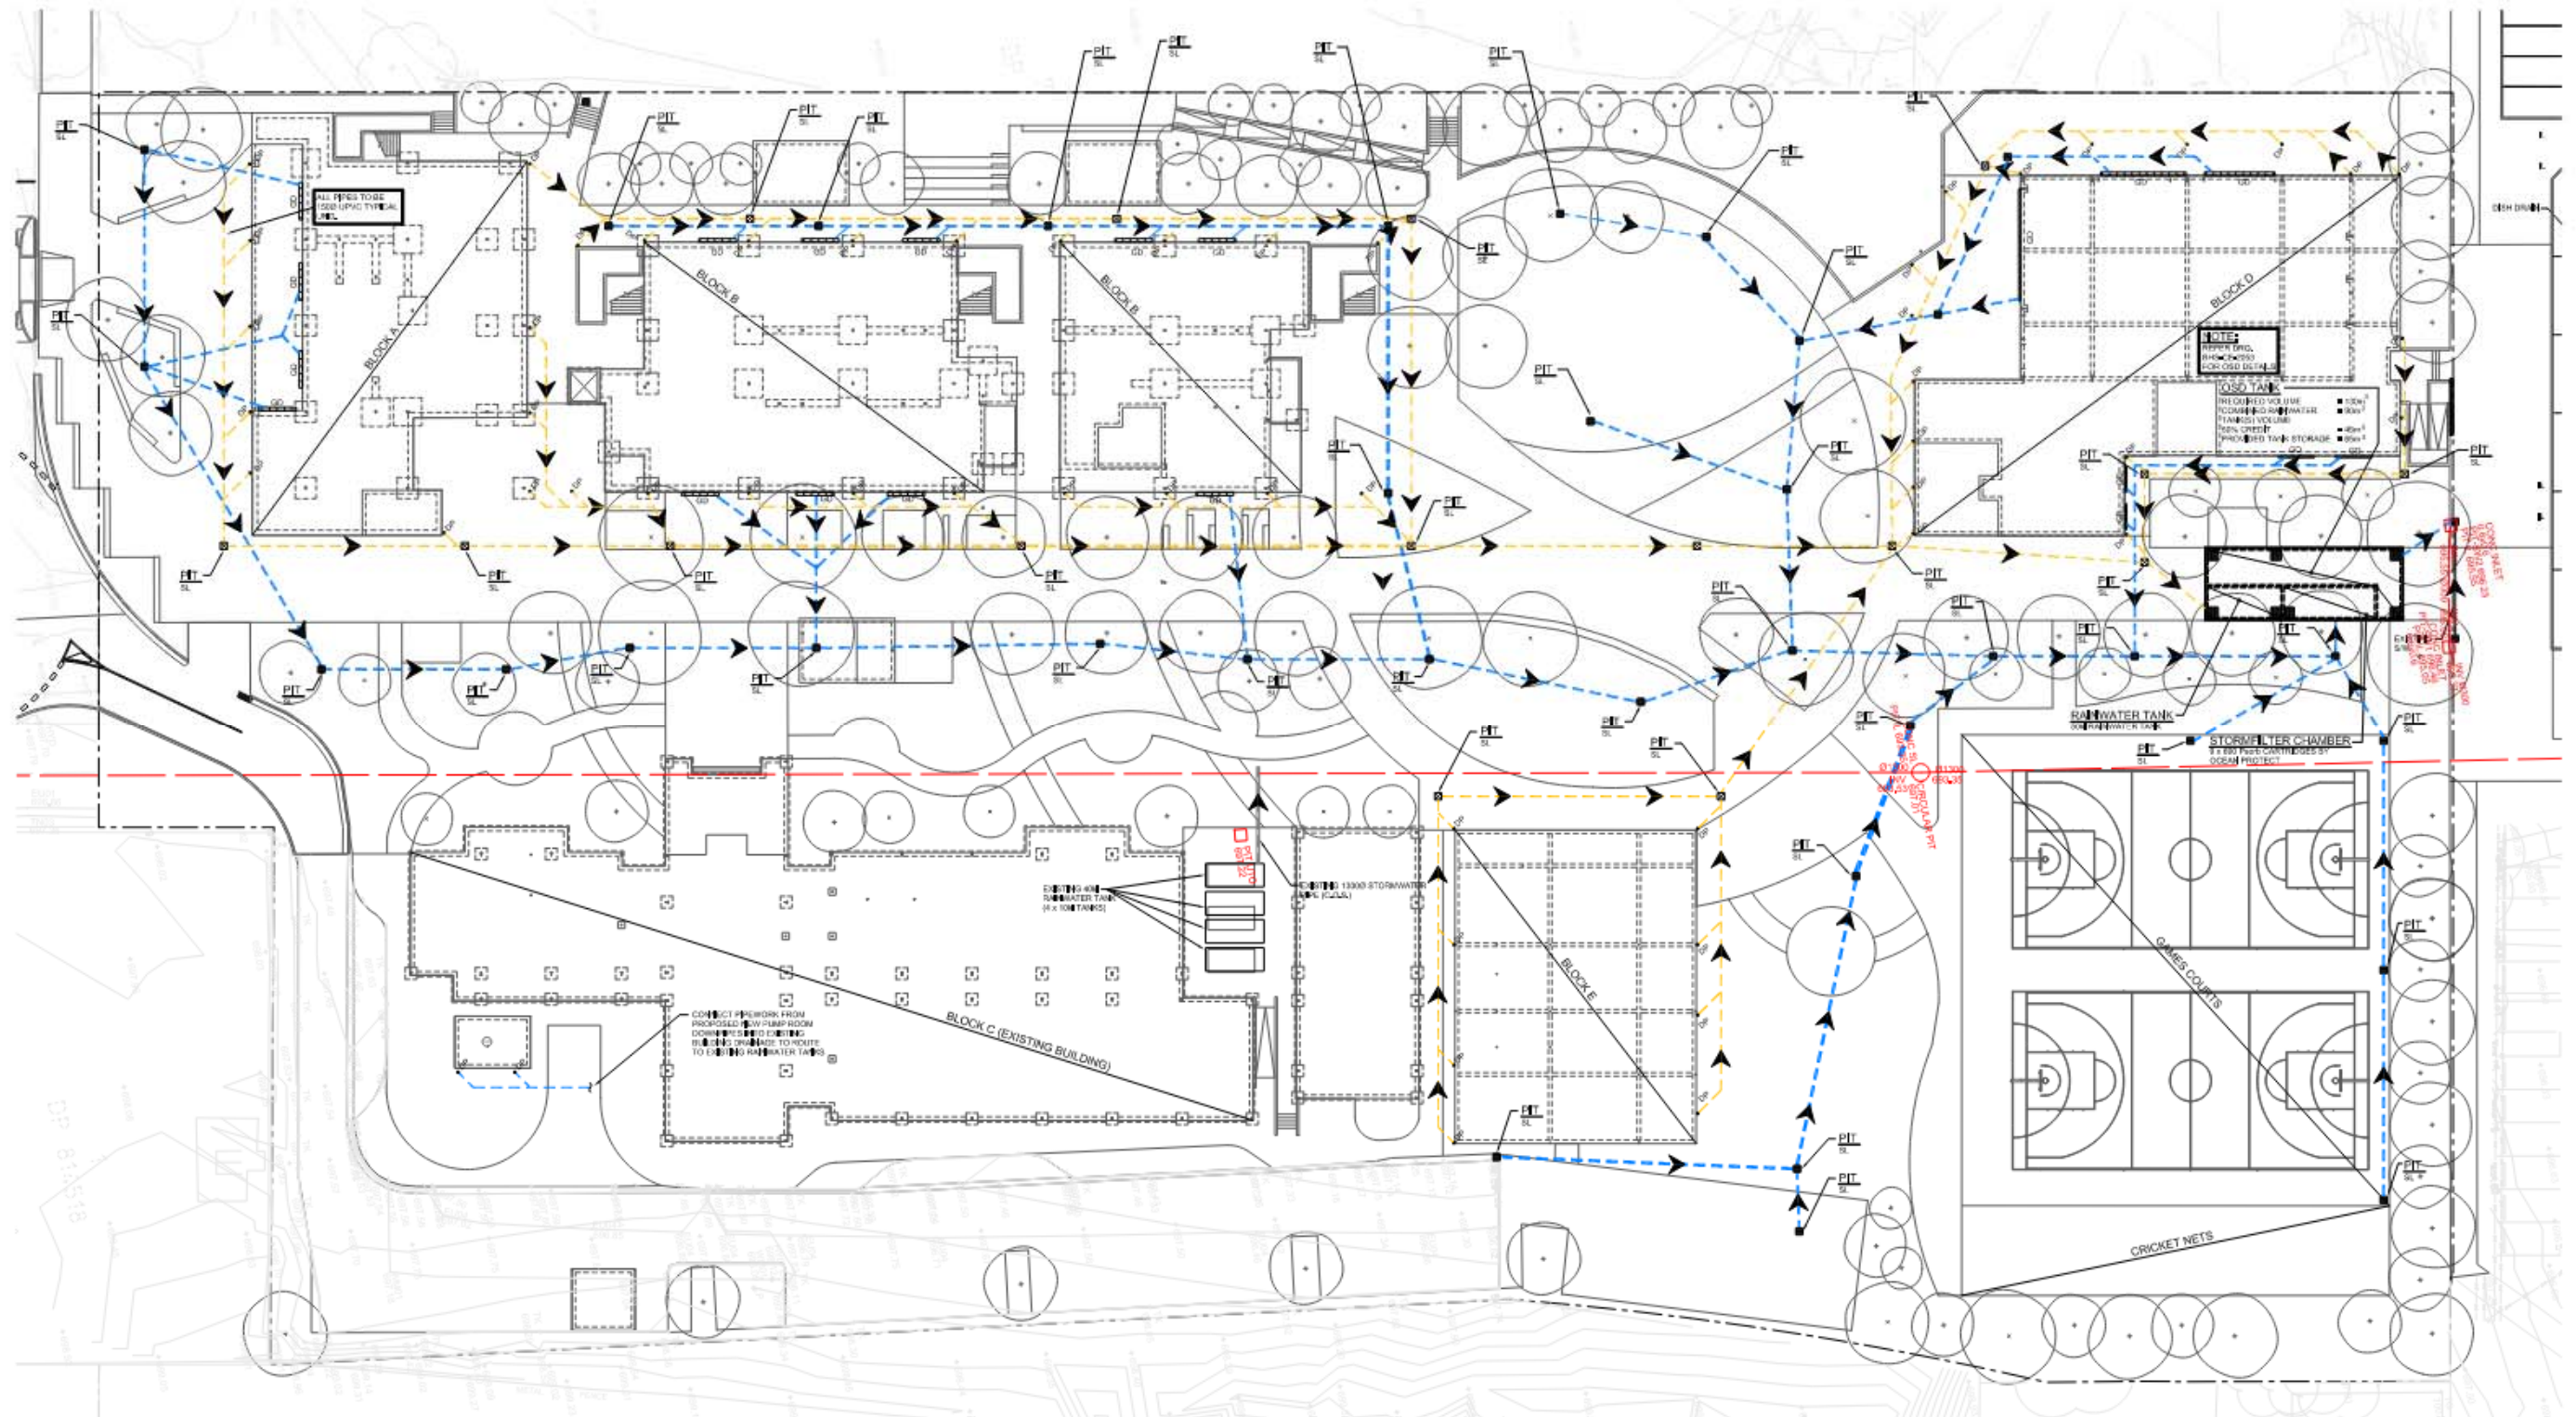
High School Site Stormwater Drainage Plan - REFER APPENDIX B FOR FULL DRAWING(S)
